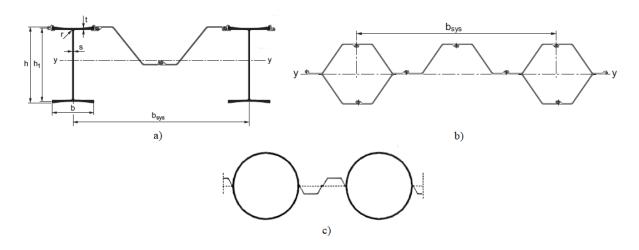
Standard combined walls a) H beam and Z-profile b) Z-profile (U-profile) box piles and Z-profile c) Steel tubes and U-profile (Z-profile) [3]
